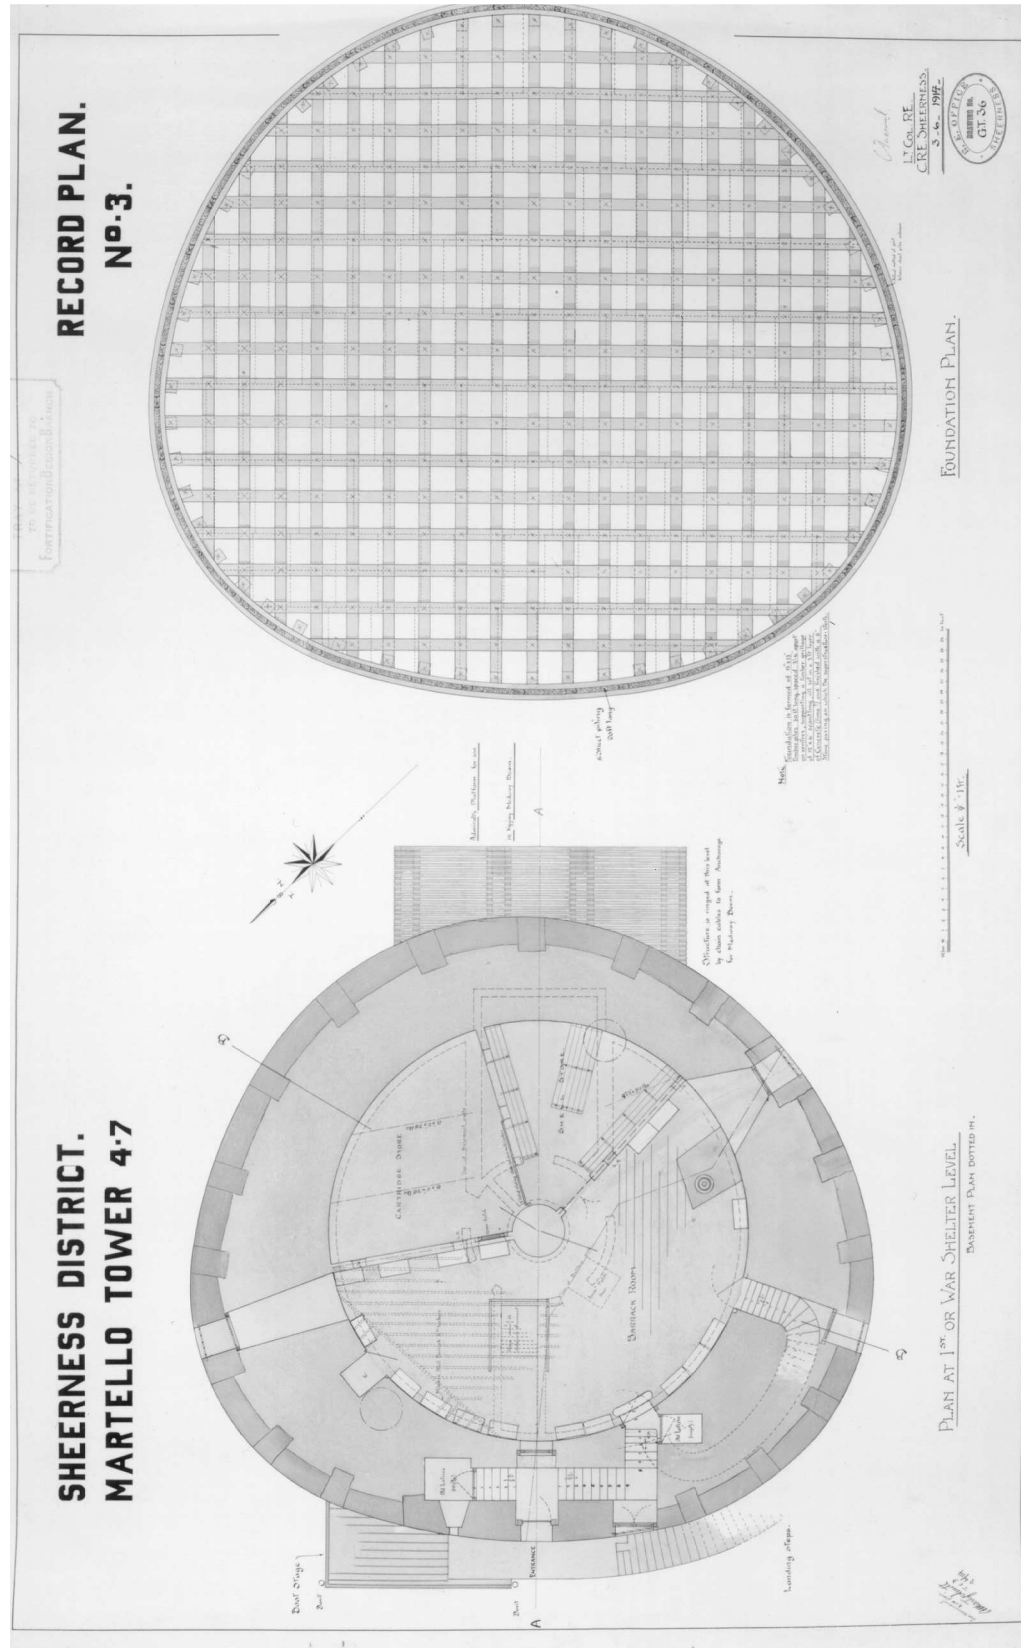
Plans dated 1914 of the ground floor and foundation level of Grain Tower (PRO: WO/78/5121/3)
